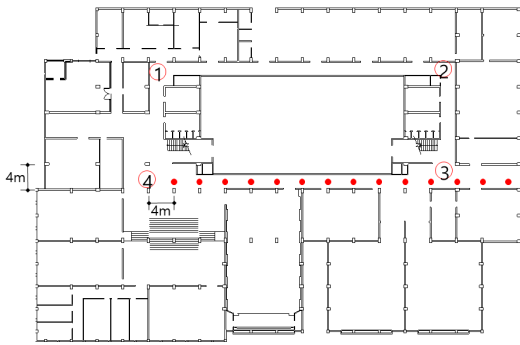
1st floor plan of the building for measuring RSSI of horizontal and vertical node
